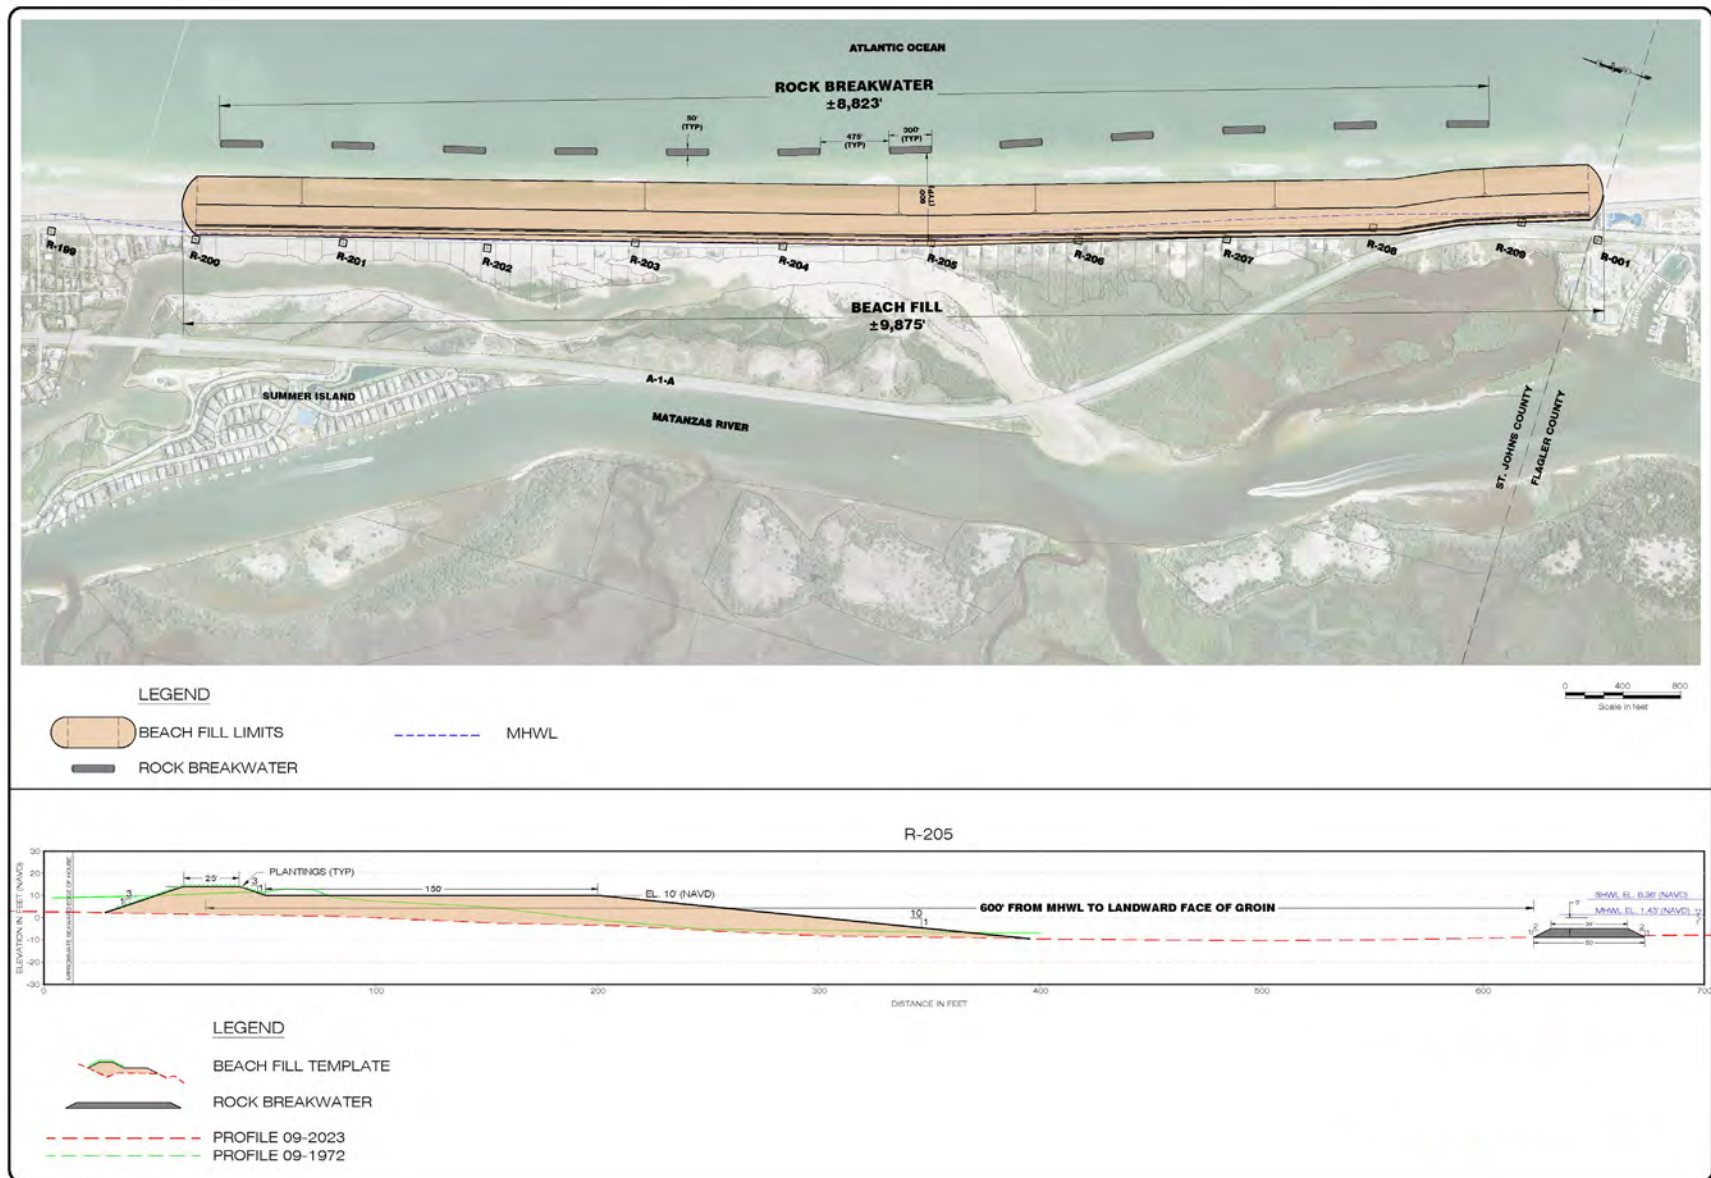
Concept Sketch – Beach and Dune Nourishment with Submerged Breakwaters
